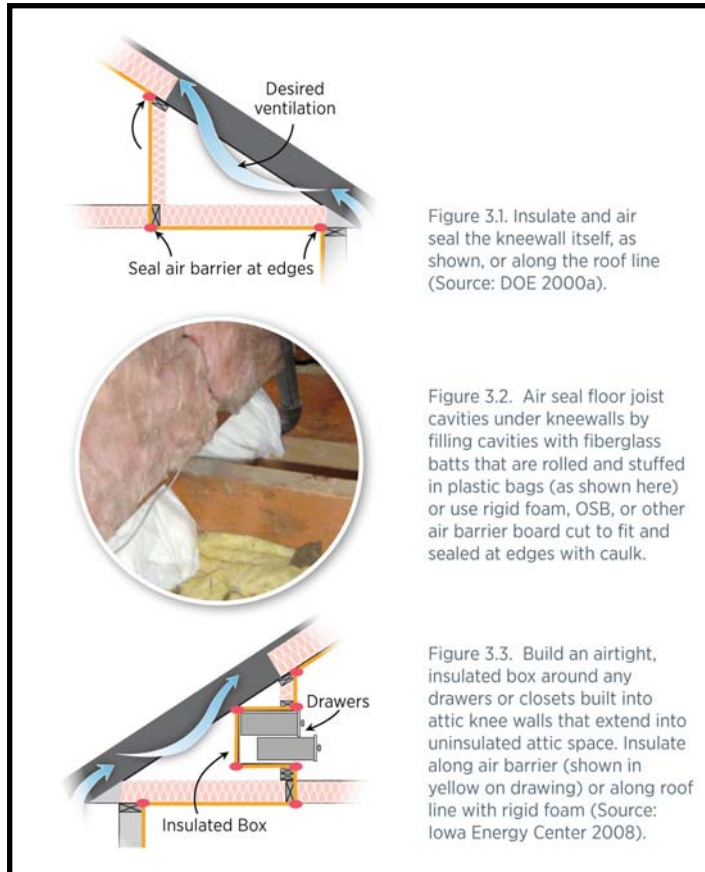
Insulate and air seal the kneewall itself, as shown, or along the roof line (Source: DOE 2000a).
